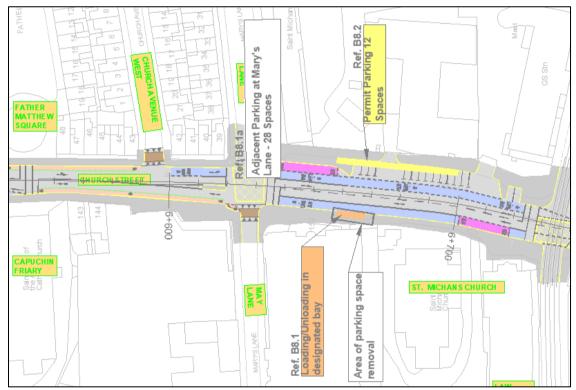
Proposed scheme design and parking changes along Church Street (Between King Street North and Chancery Street)
